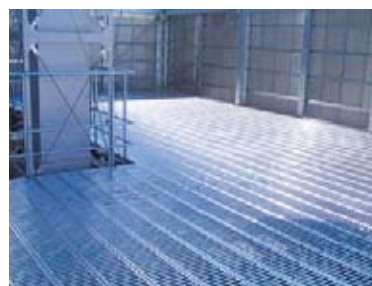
shows two examples of application. “JFE ECOGAL®” has been used in a wide range of applications, including housing materials such as posts, beams and other structural members, roofing, walls, etc., steel flooring panels such as grating, scaffold boards, etc., building hardware such as C channels, L-shaped angles, joint materials, cable racks, etc., and in post-painted applications such as storerooms and steel stockers, in the agricultural and livestock fields, etc. Further expansion to home electrical appliances and other fields is expected in the future.
